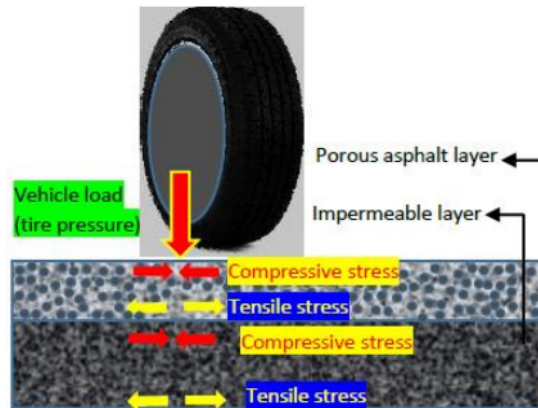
Behavior of multi-layered pavement subjected to a vehicle load
